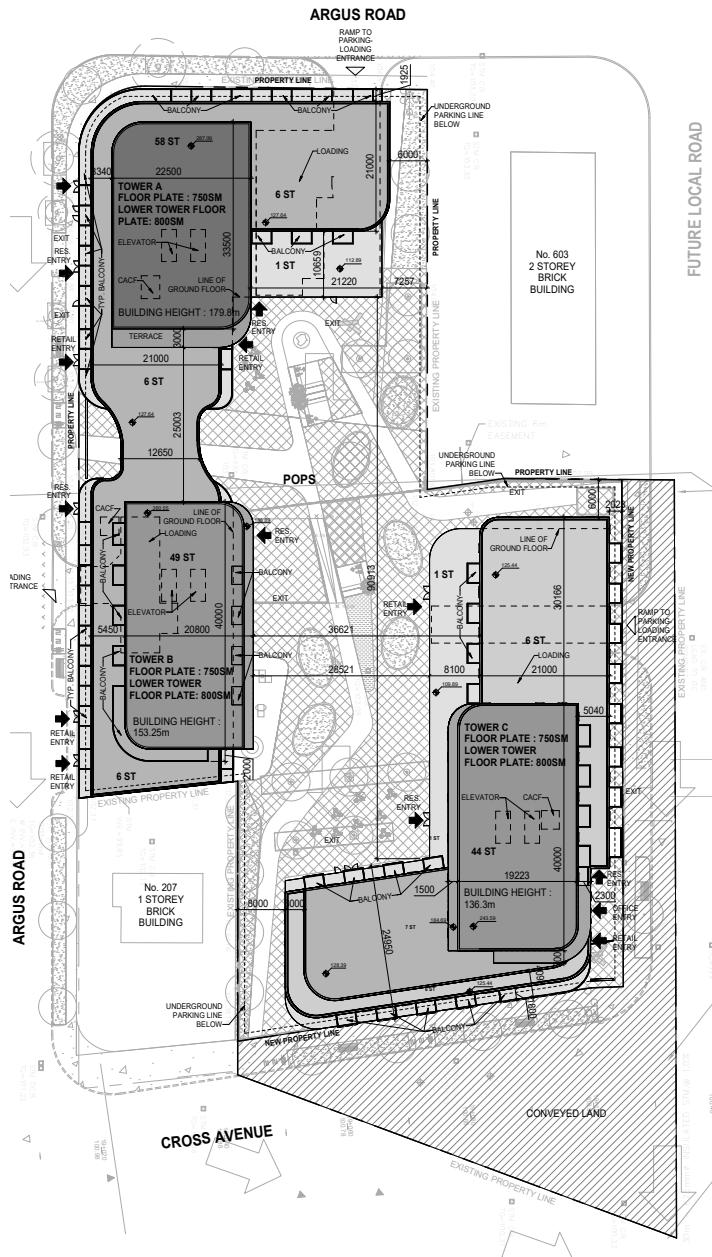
Site Plan (Provided by BDP Quadrangle)
